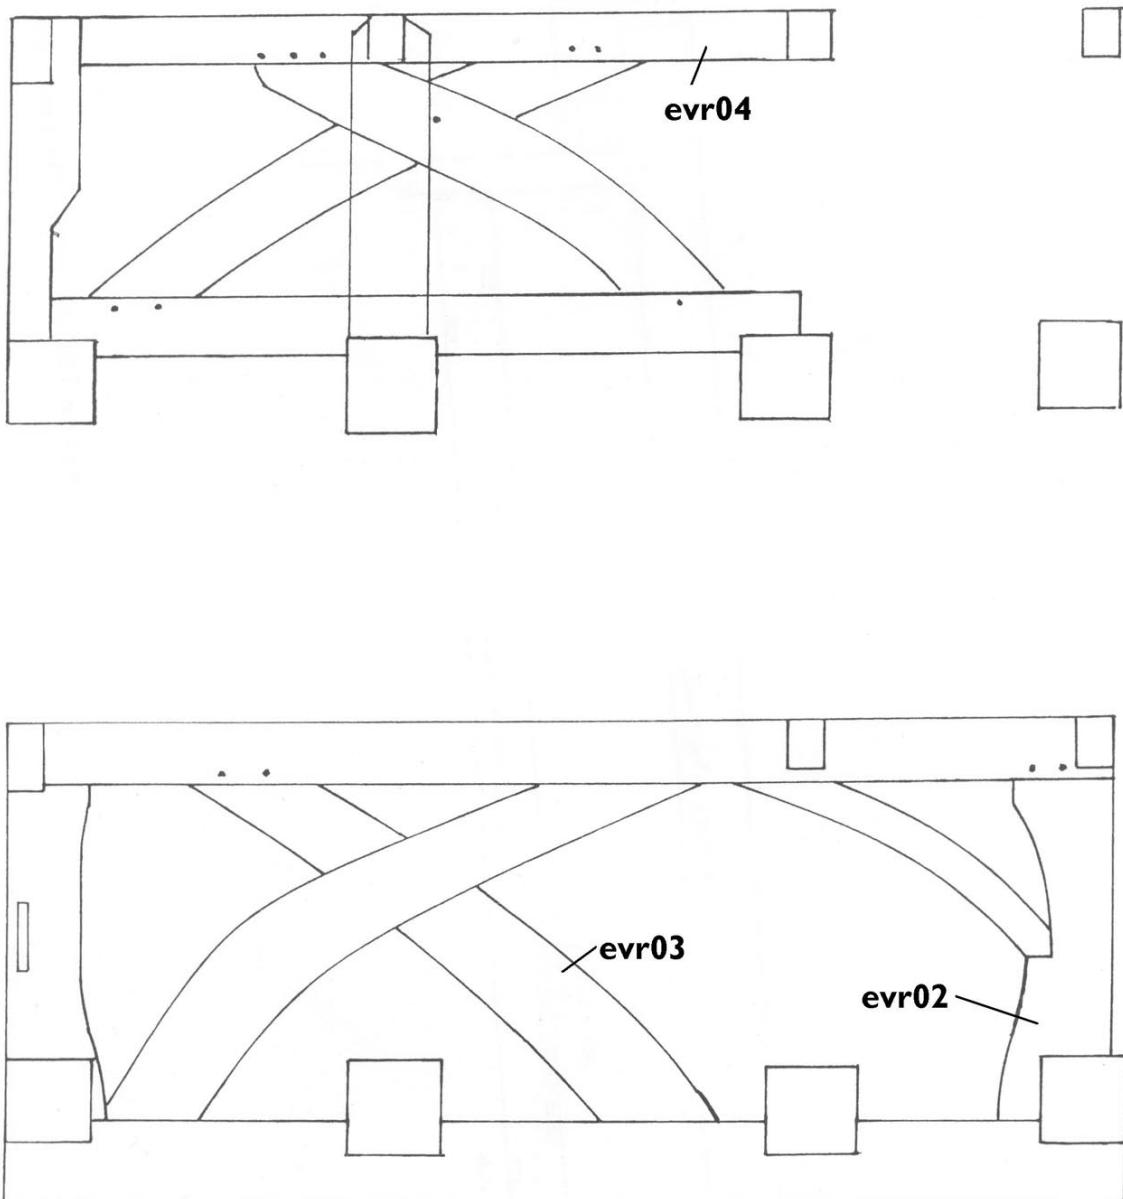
West side inner and outer trusses viewed from the east, showing the bellframe timbers sampled for dendrochronology. Adapted from an original drawing by Anthony Baggs (2005)
